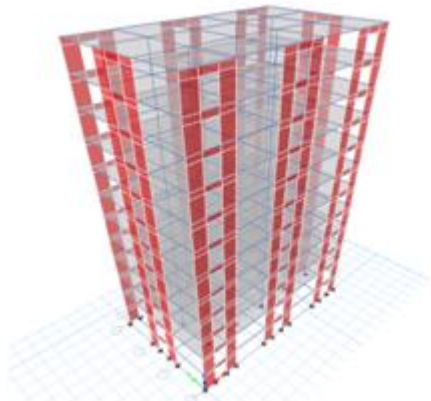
3D of Coupled Shear Wall Structure Model 04
